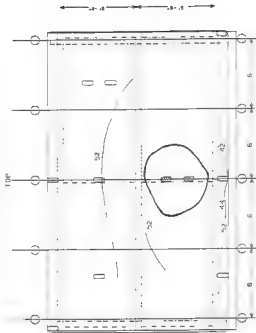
Top Cracking Pattern (First Bridge - Test No 4)
